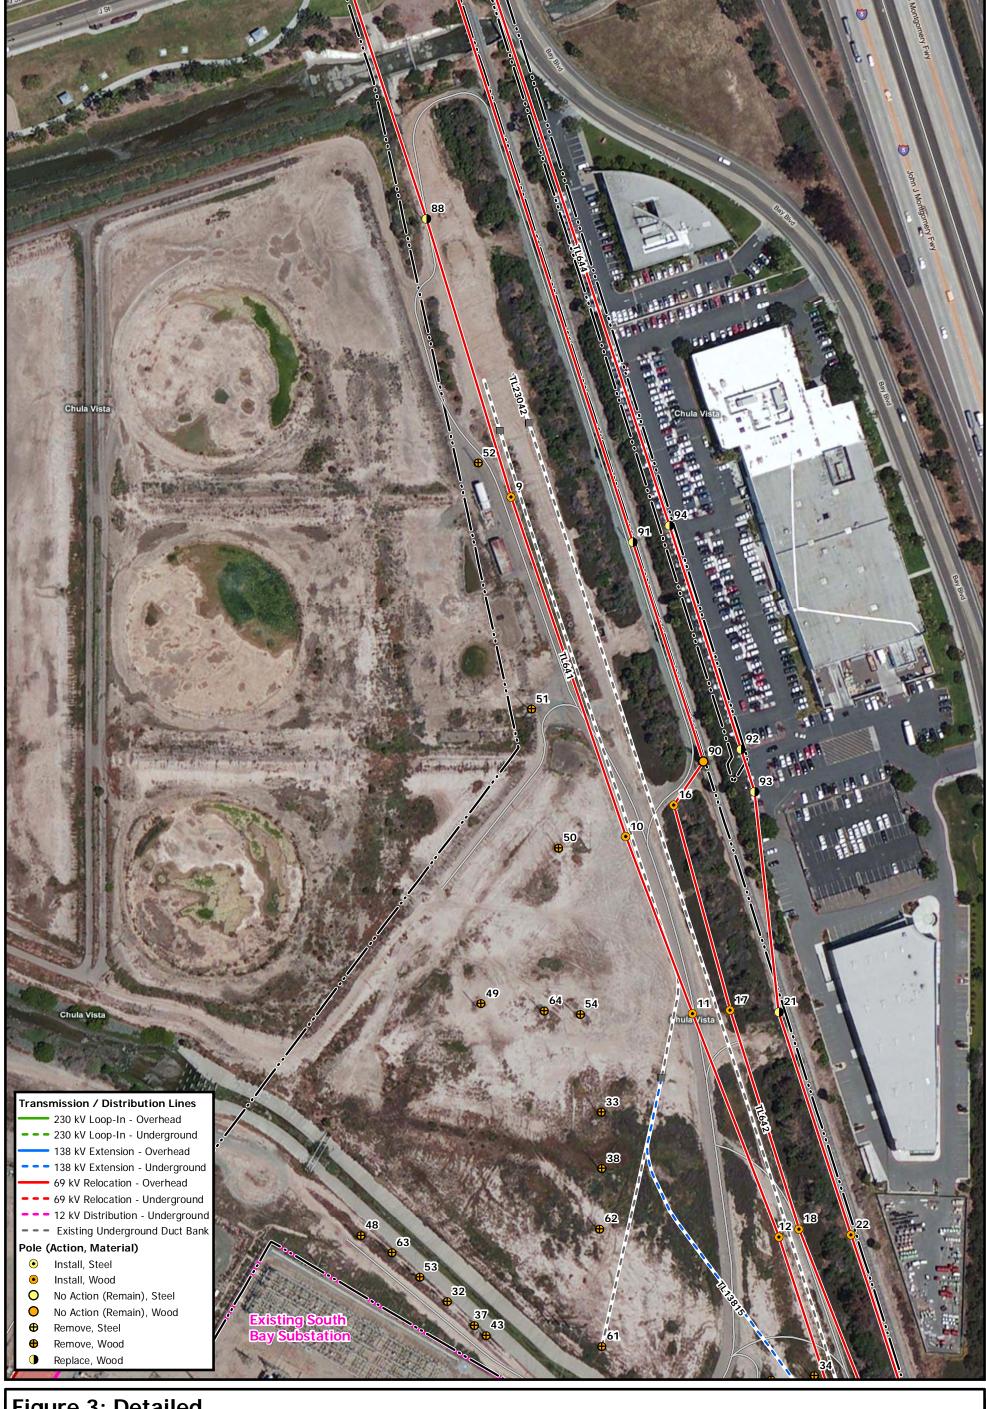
Detailed Project Components Map 3 of 3 South Bay Substation Relocation Project Water Quality Retention Basin Substation Wall New Access Routes and Driveways NSIGNIA n ___ 0 12.42-Acre Parcel Boundary Additional Temporary Workspace Engineered Wetland 1:1,600 SDG&E Easement Existing Access Underground Vault (Color Coded by Line) 200 50 400
